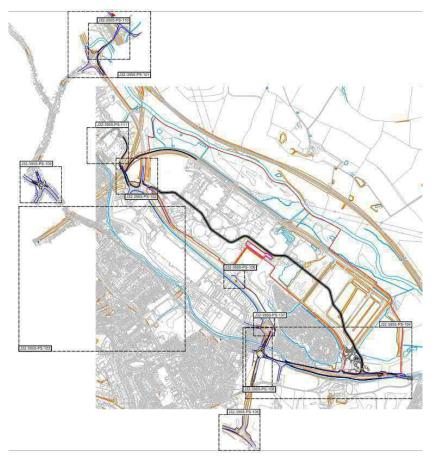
Extract from Overview Plan showing locations of proposed highway improvement works with corresponding Drawing No. referenced
